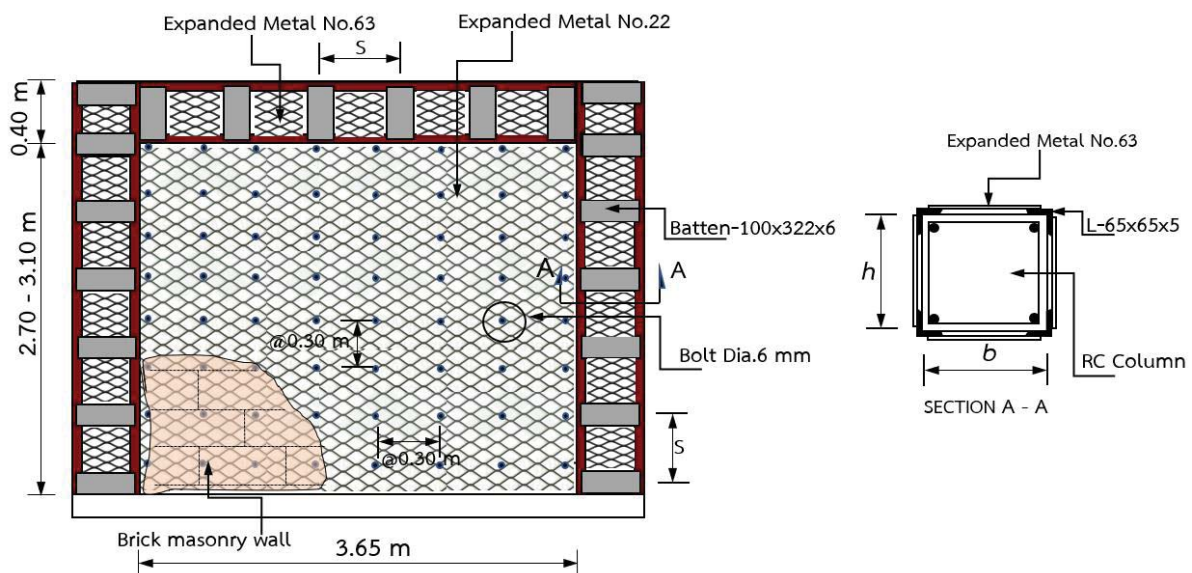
Strengthening by steel cage and masonry infilled wall with expanded metal.
